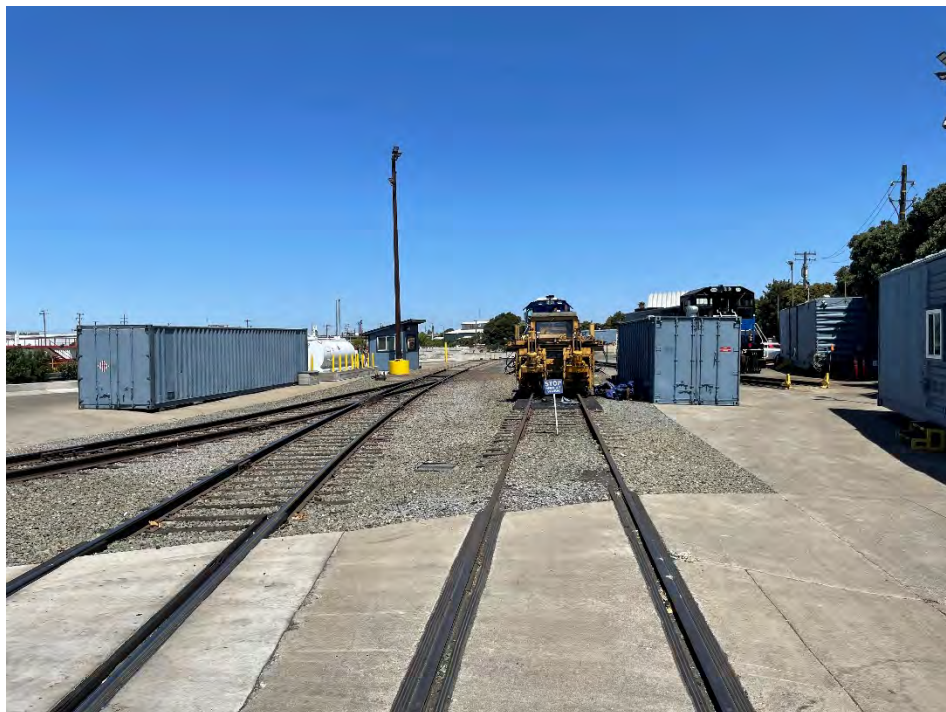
Looking north toward the railroad maintenance area in SW-5. Gravel cover in good condition with no geotextile exposed.
